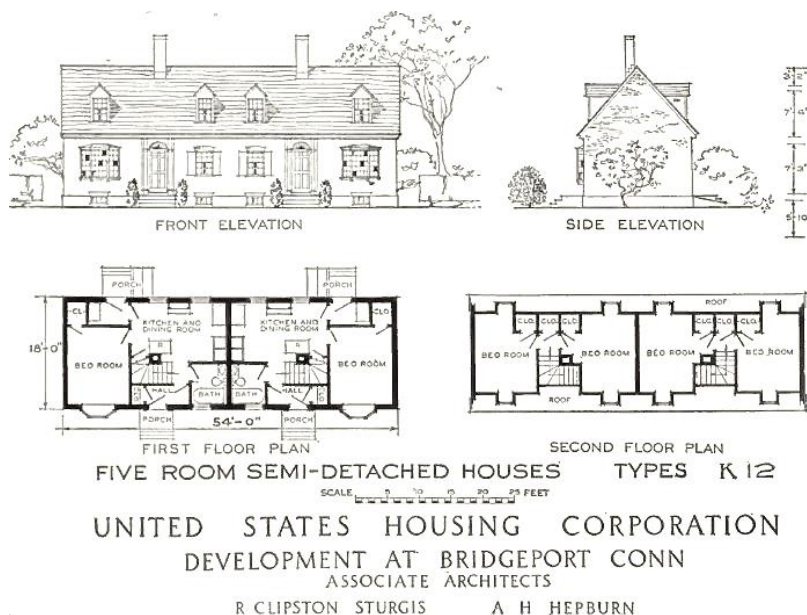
Exterior and Floor Plans for Row Houses in Seaside Village, 1919 (See Appendix A for more floor plans)
